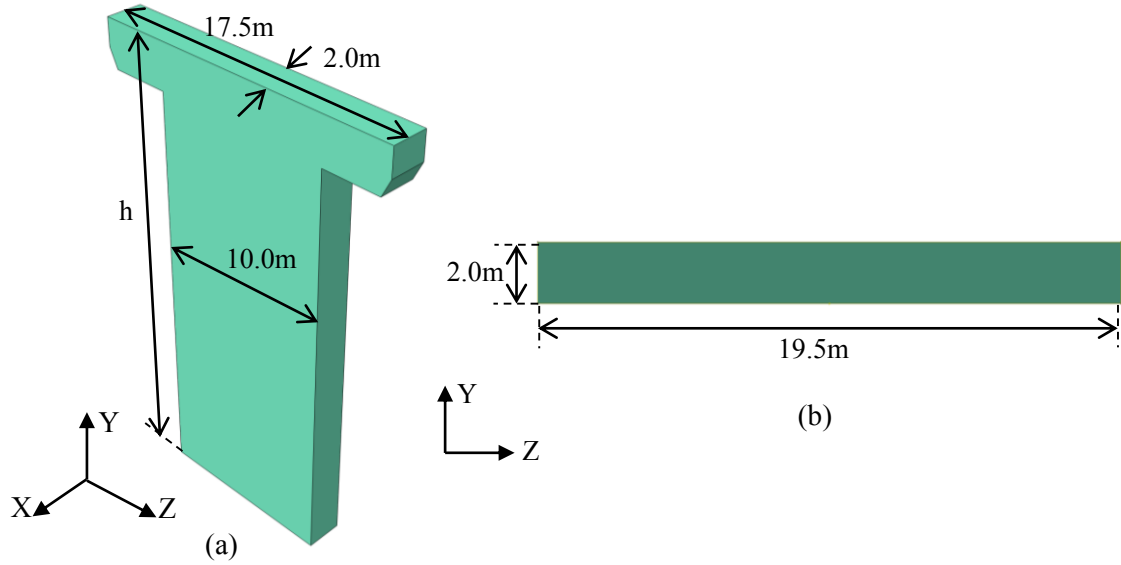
Multi-span bridge models (SC & CC): (a) pier geometry; and (b) deck cross-section geometry.
